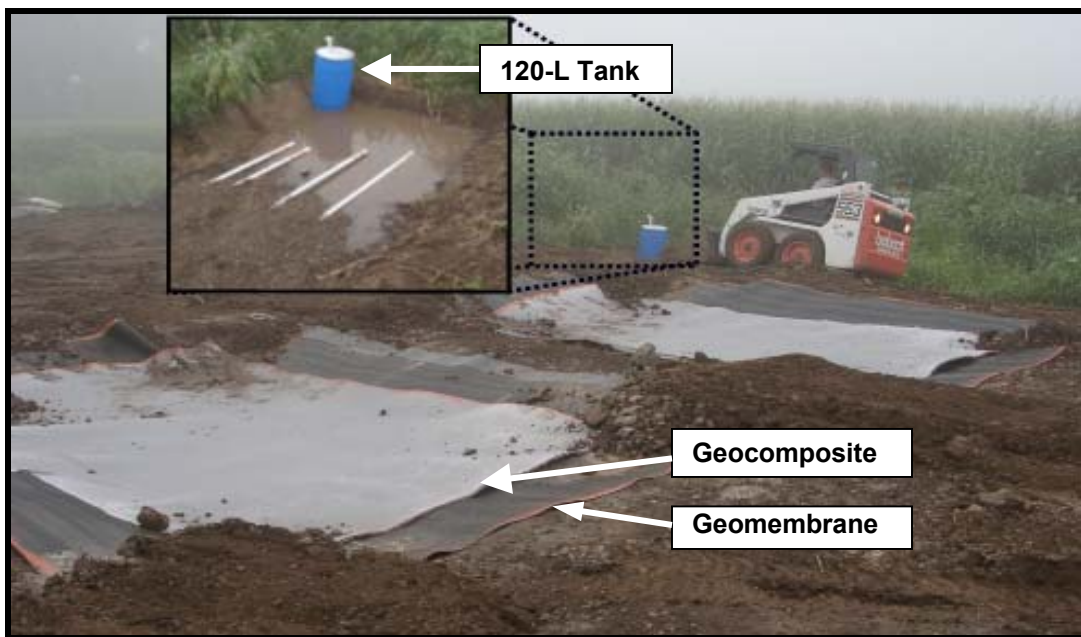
Construction of Lysimeters at STH 60 Site.
